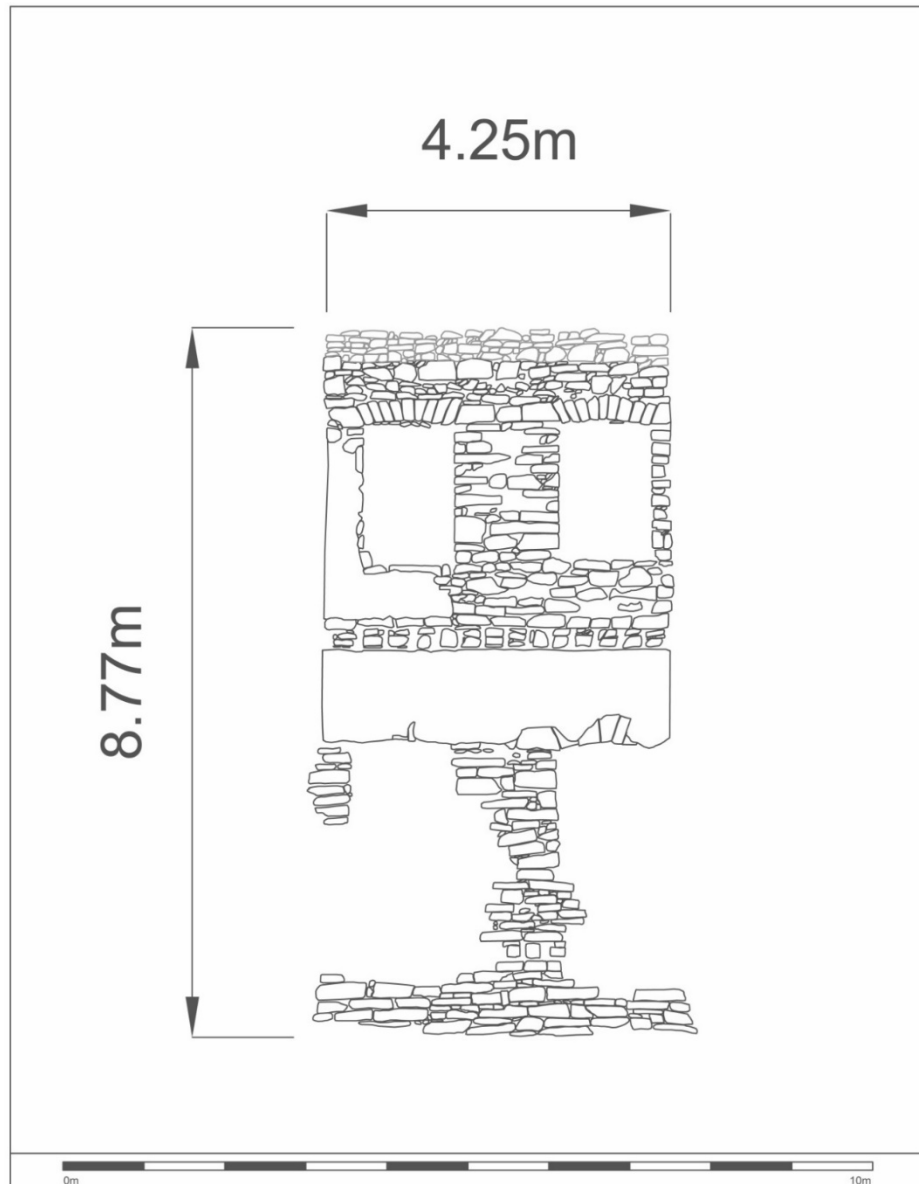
Internal elevation of the north wall at the signal tower at Glash Signal Station.
